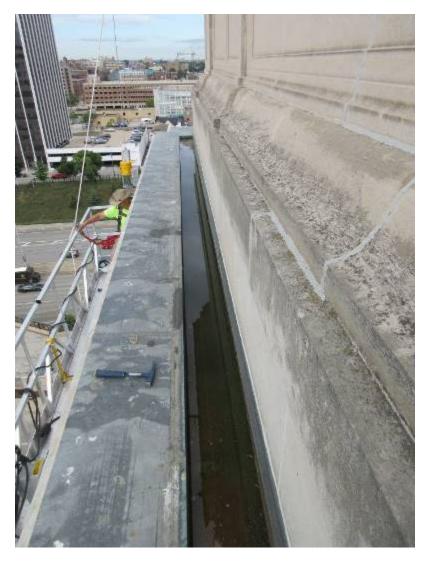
Ponding water in gutter at west end of south elevation. Extends around the corner on the west elevation.
